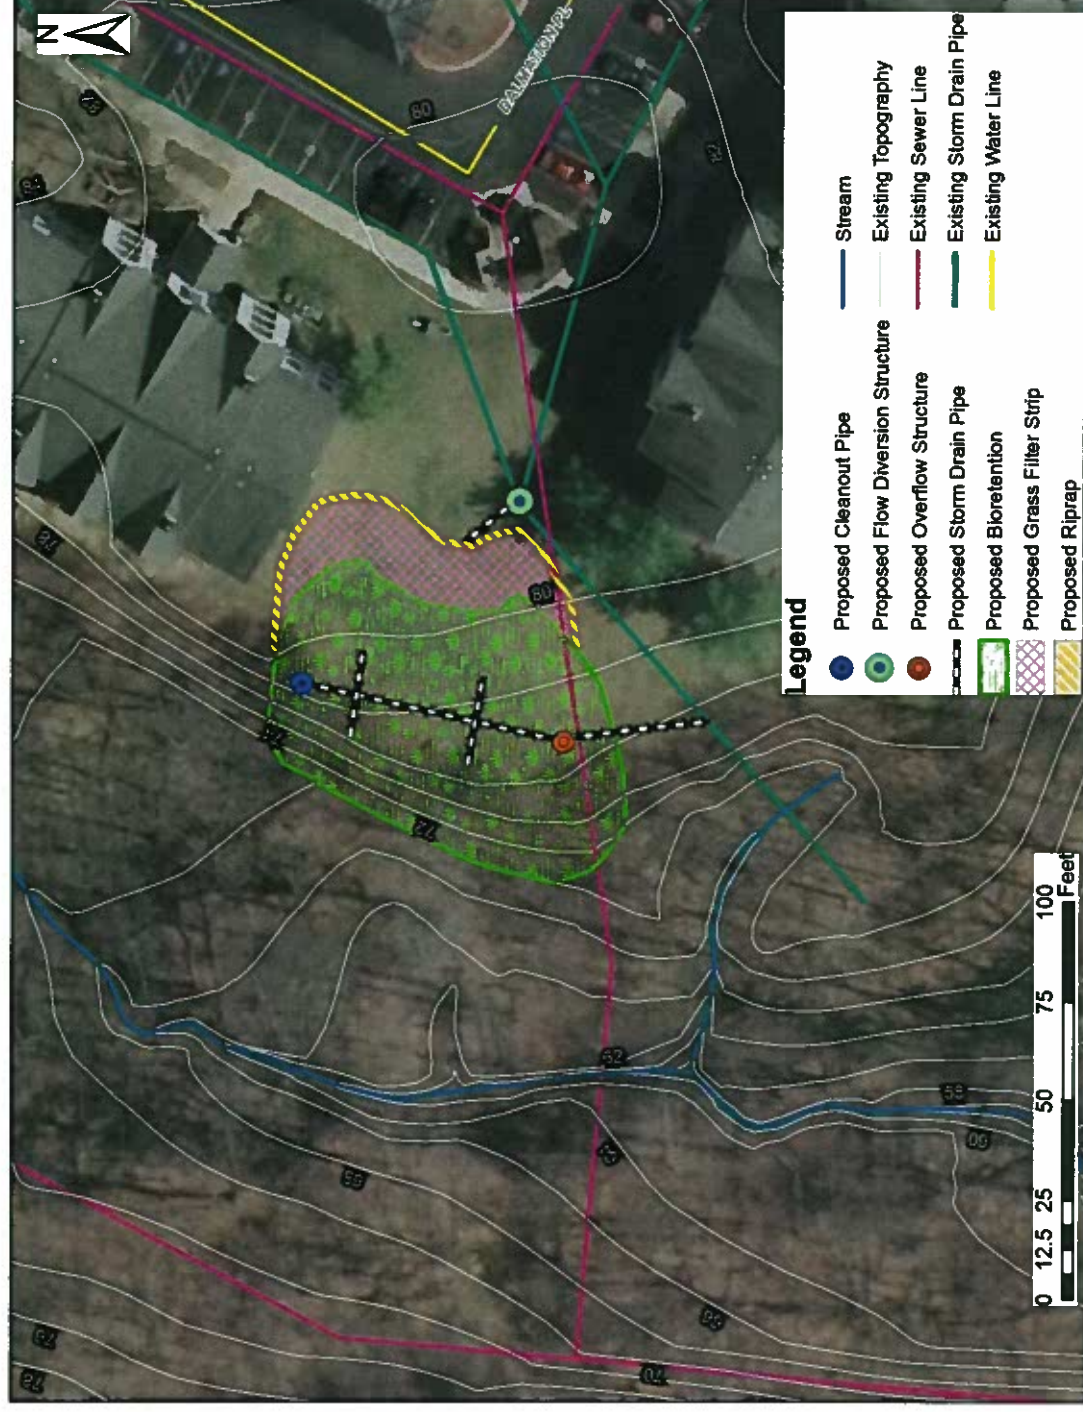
Proposed structural stormwater improvement at site D-NS-8
